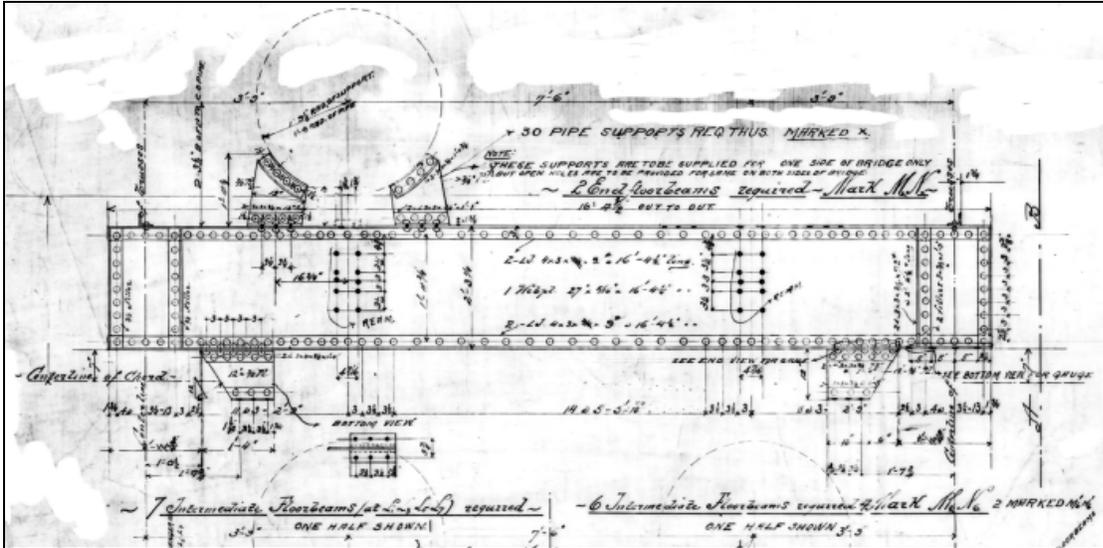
An excerpt from the as-constructed drawing showing a typical floor beam and conduit support. The second big conduit on the right is not shown.
